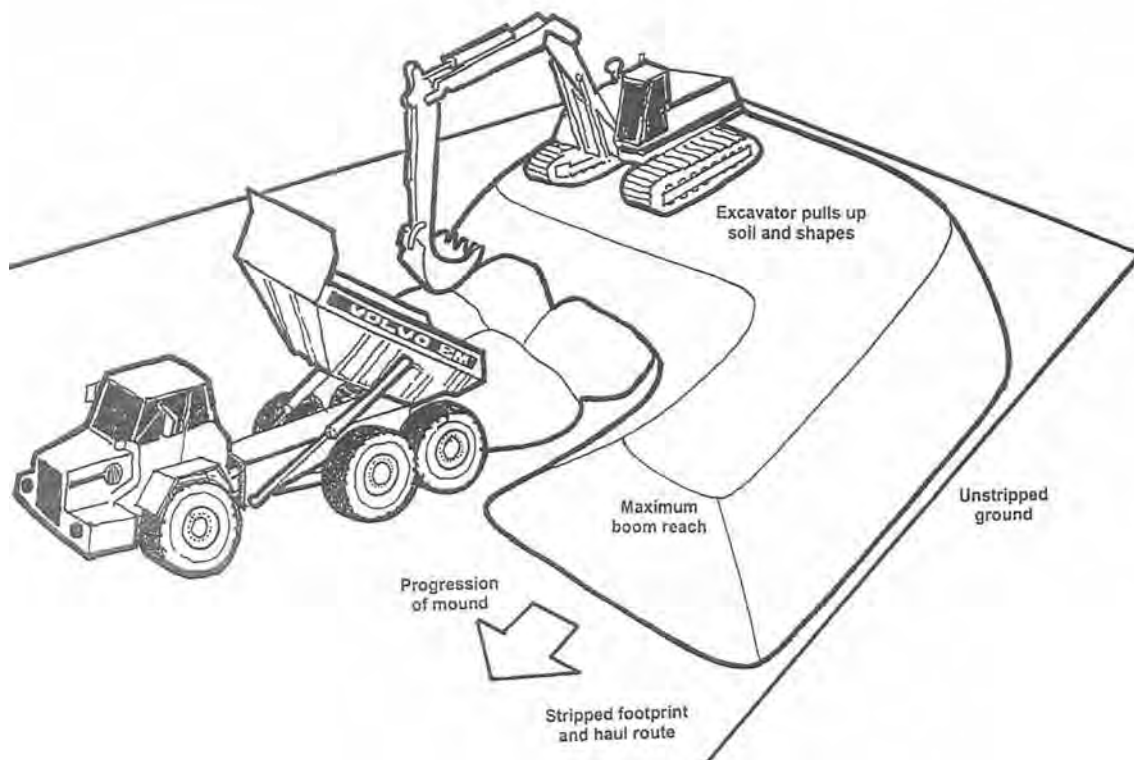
Soil Storage mound construction with excavators and dump trucks:
